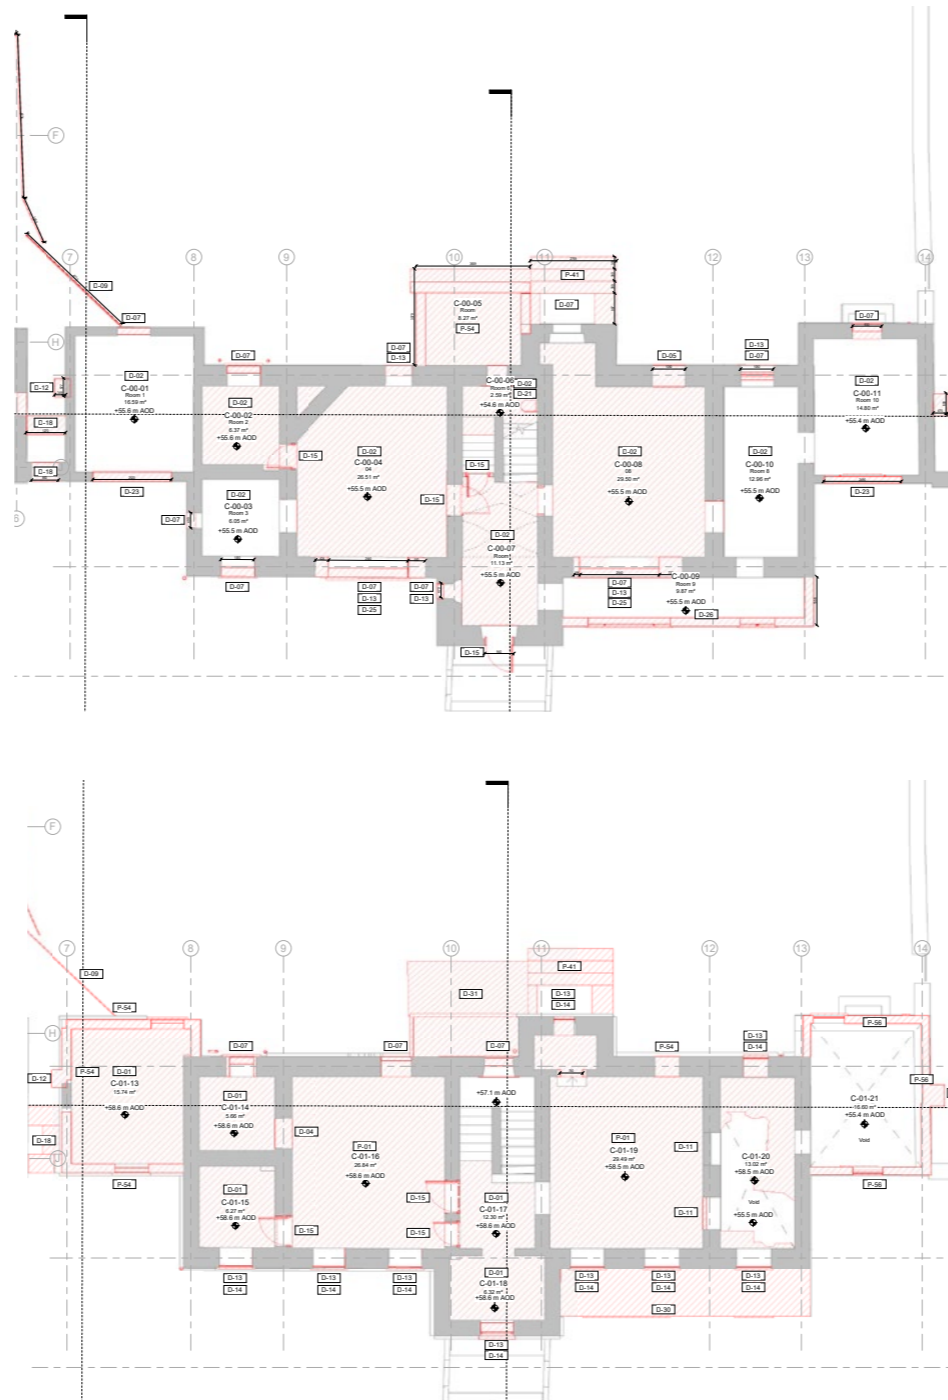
; Existing Ground and First Floor Plan. Removals in Red
